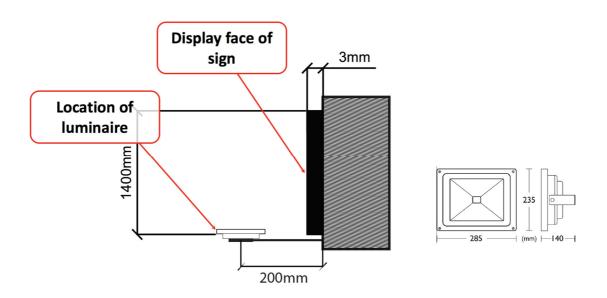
Side view of the proposed sign with upward facing flood light (luminaire)
